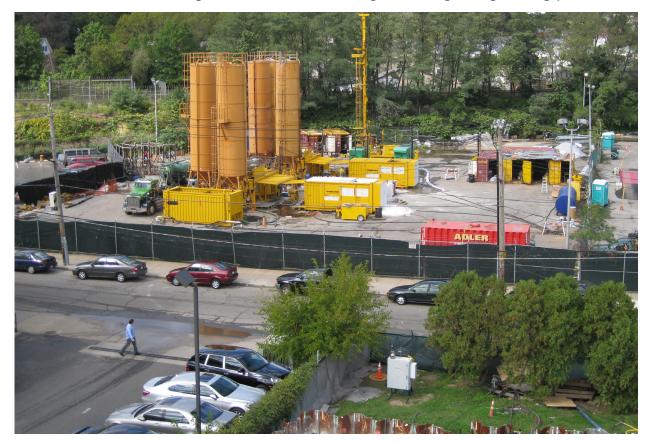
PACCHIOSI Jet Grouitng plant installations.
